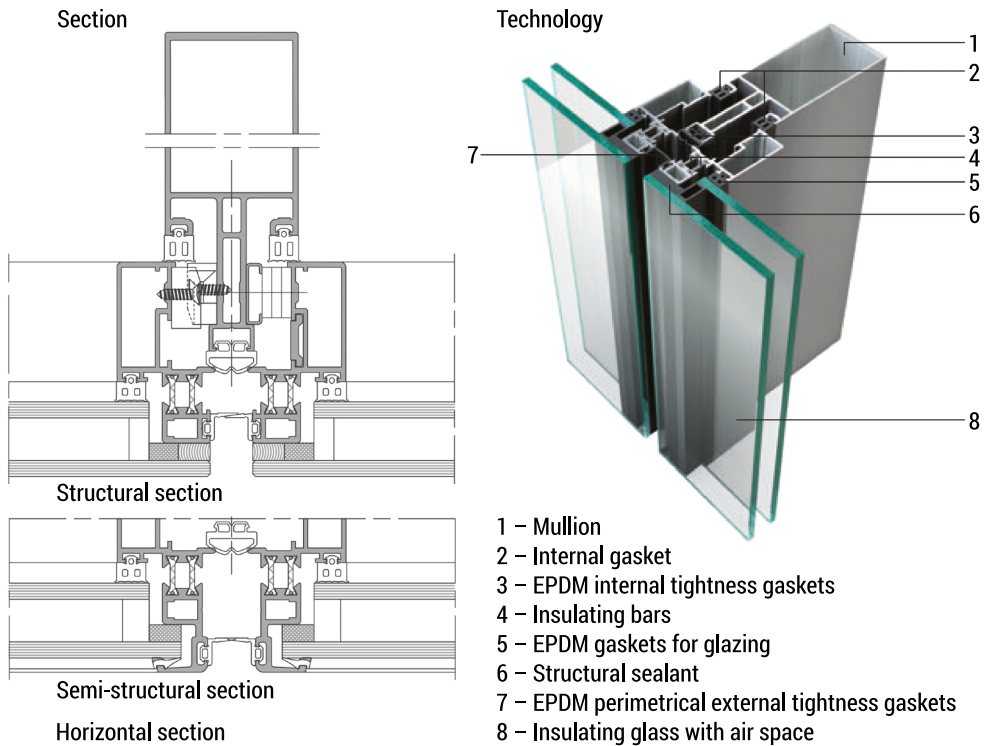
Cross-section of the mullion and three-dimensional view of a stick system façades with bonded fixing (Source: The technical material in question is the property of METRA Spa)
